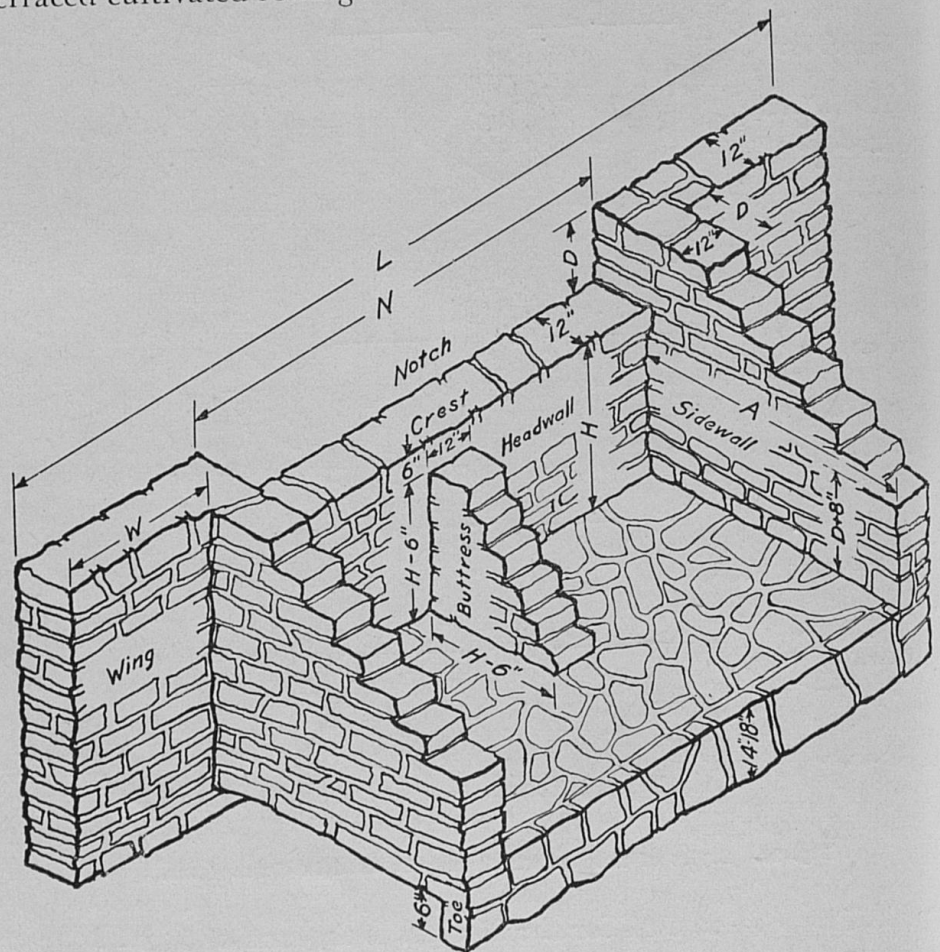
Typical rubble masonry dam for terrace outlet or gully control.
